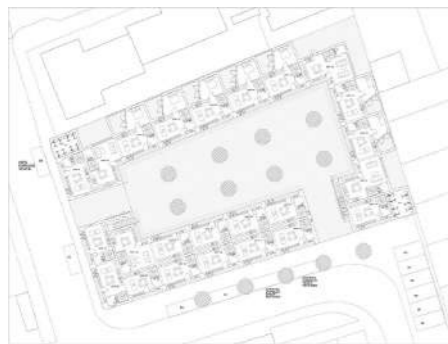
McGarth Road Published Plan with no gates or doors drawn at the entrances despite gates being drawn elsewhere
